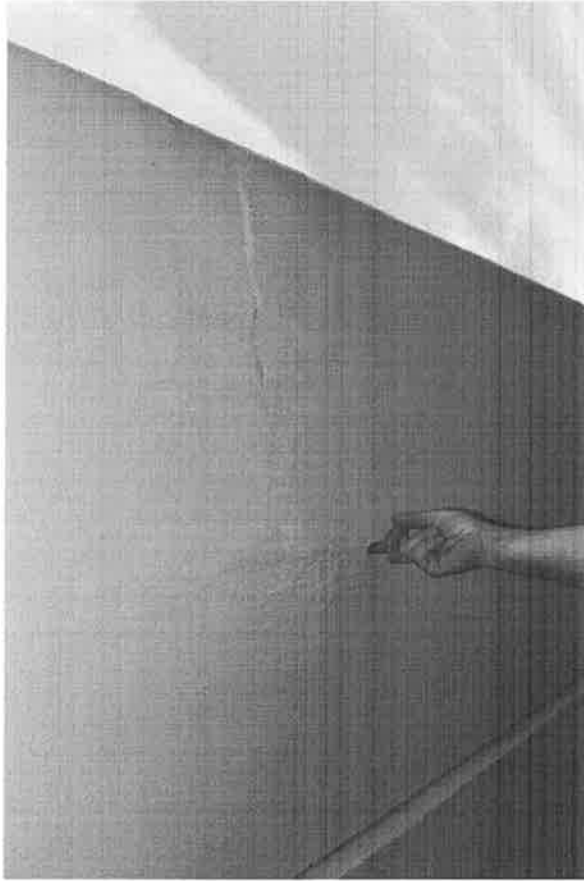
Isolated cracking along direction of pre-stress cable in hollow core concrete panel (typical)
